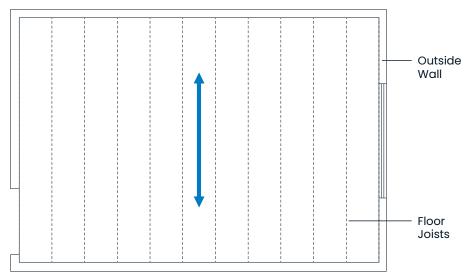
For carpeted floors, install Quik Trak panels parallel to the exterior wall to allow the warmest water to reach the coldest area first.
